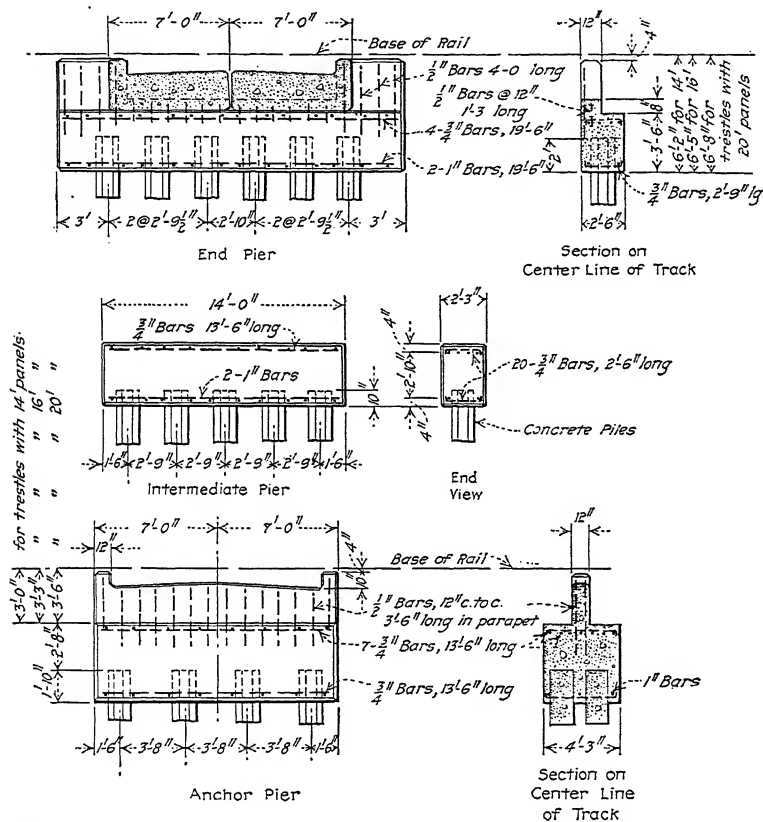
Details of substructure, standard concrete pile trestle, Illinois Central R. R.
